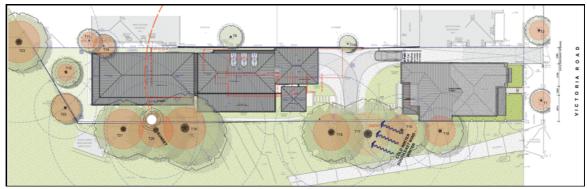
Proposed site plan showing location of existing trees and tree protection zones (blue dashed circles).
